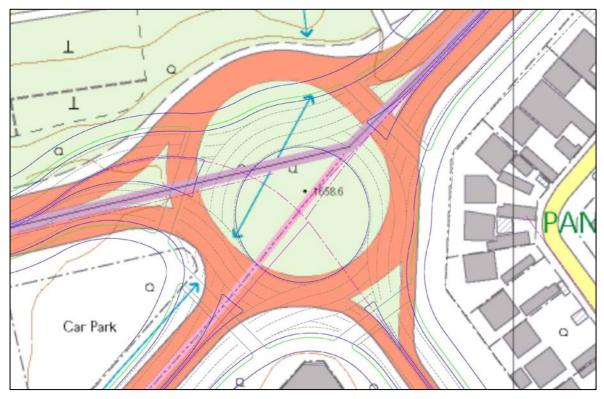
JUNCTION IMPROVEMETN PLAN AT MURANGA RD. W/ FOREST RD.-1
